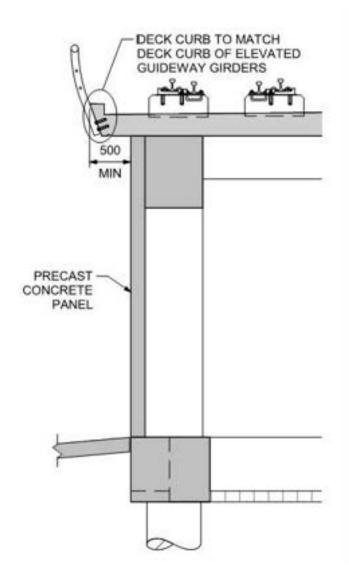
D: 87 Avenue Elevated Guideway Ramp Partial Section - Box Girder
